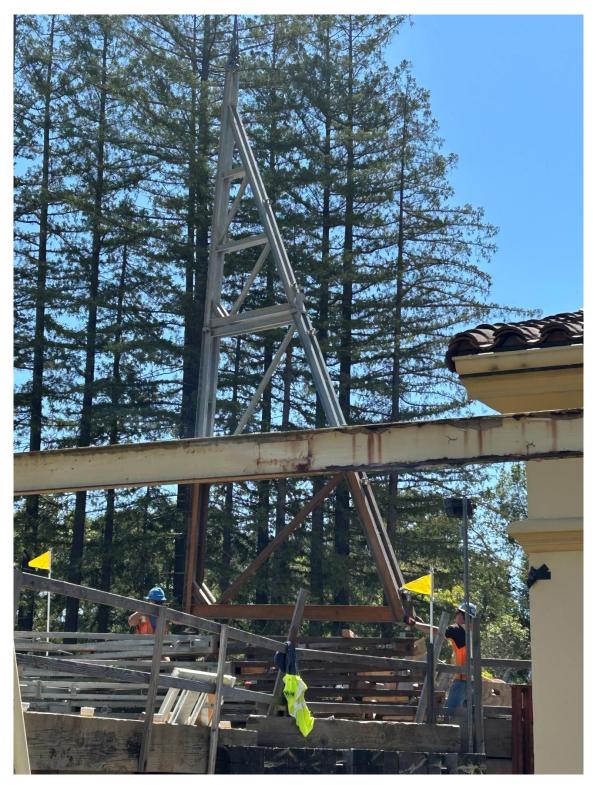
Carpenters setting down a massive steel bracing with the aid of the tower crane. These bracing segments are engineered to support the 25-feet tall concrete wall forms.
